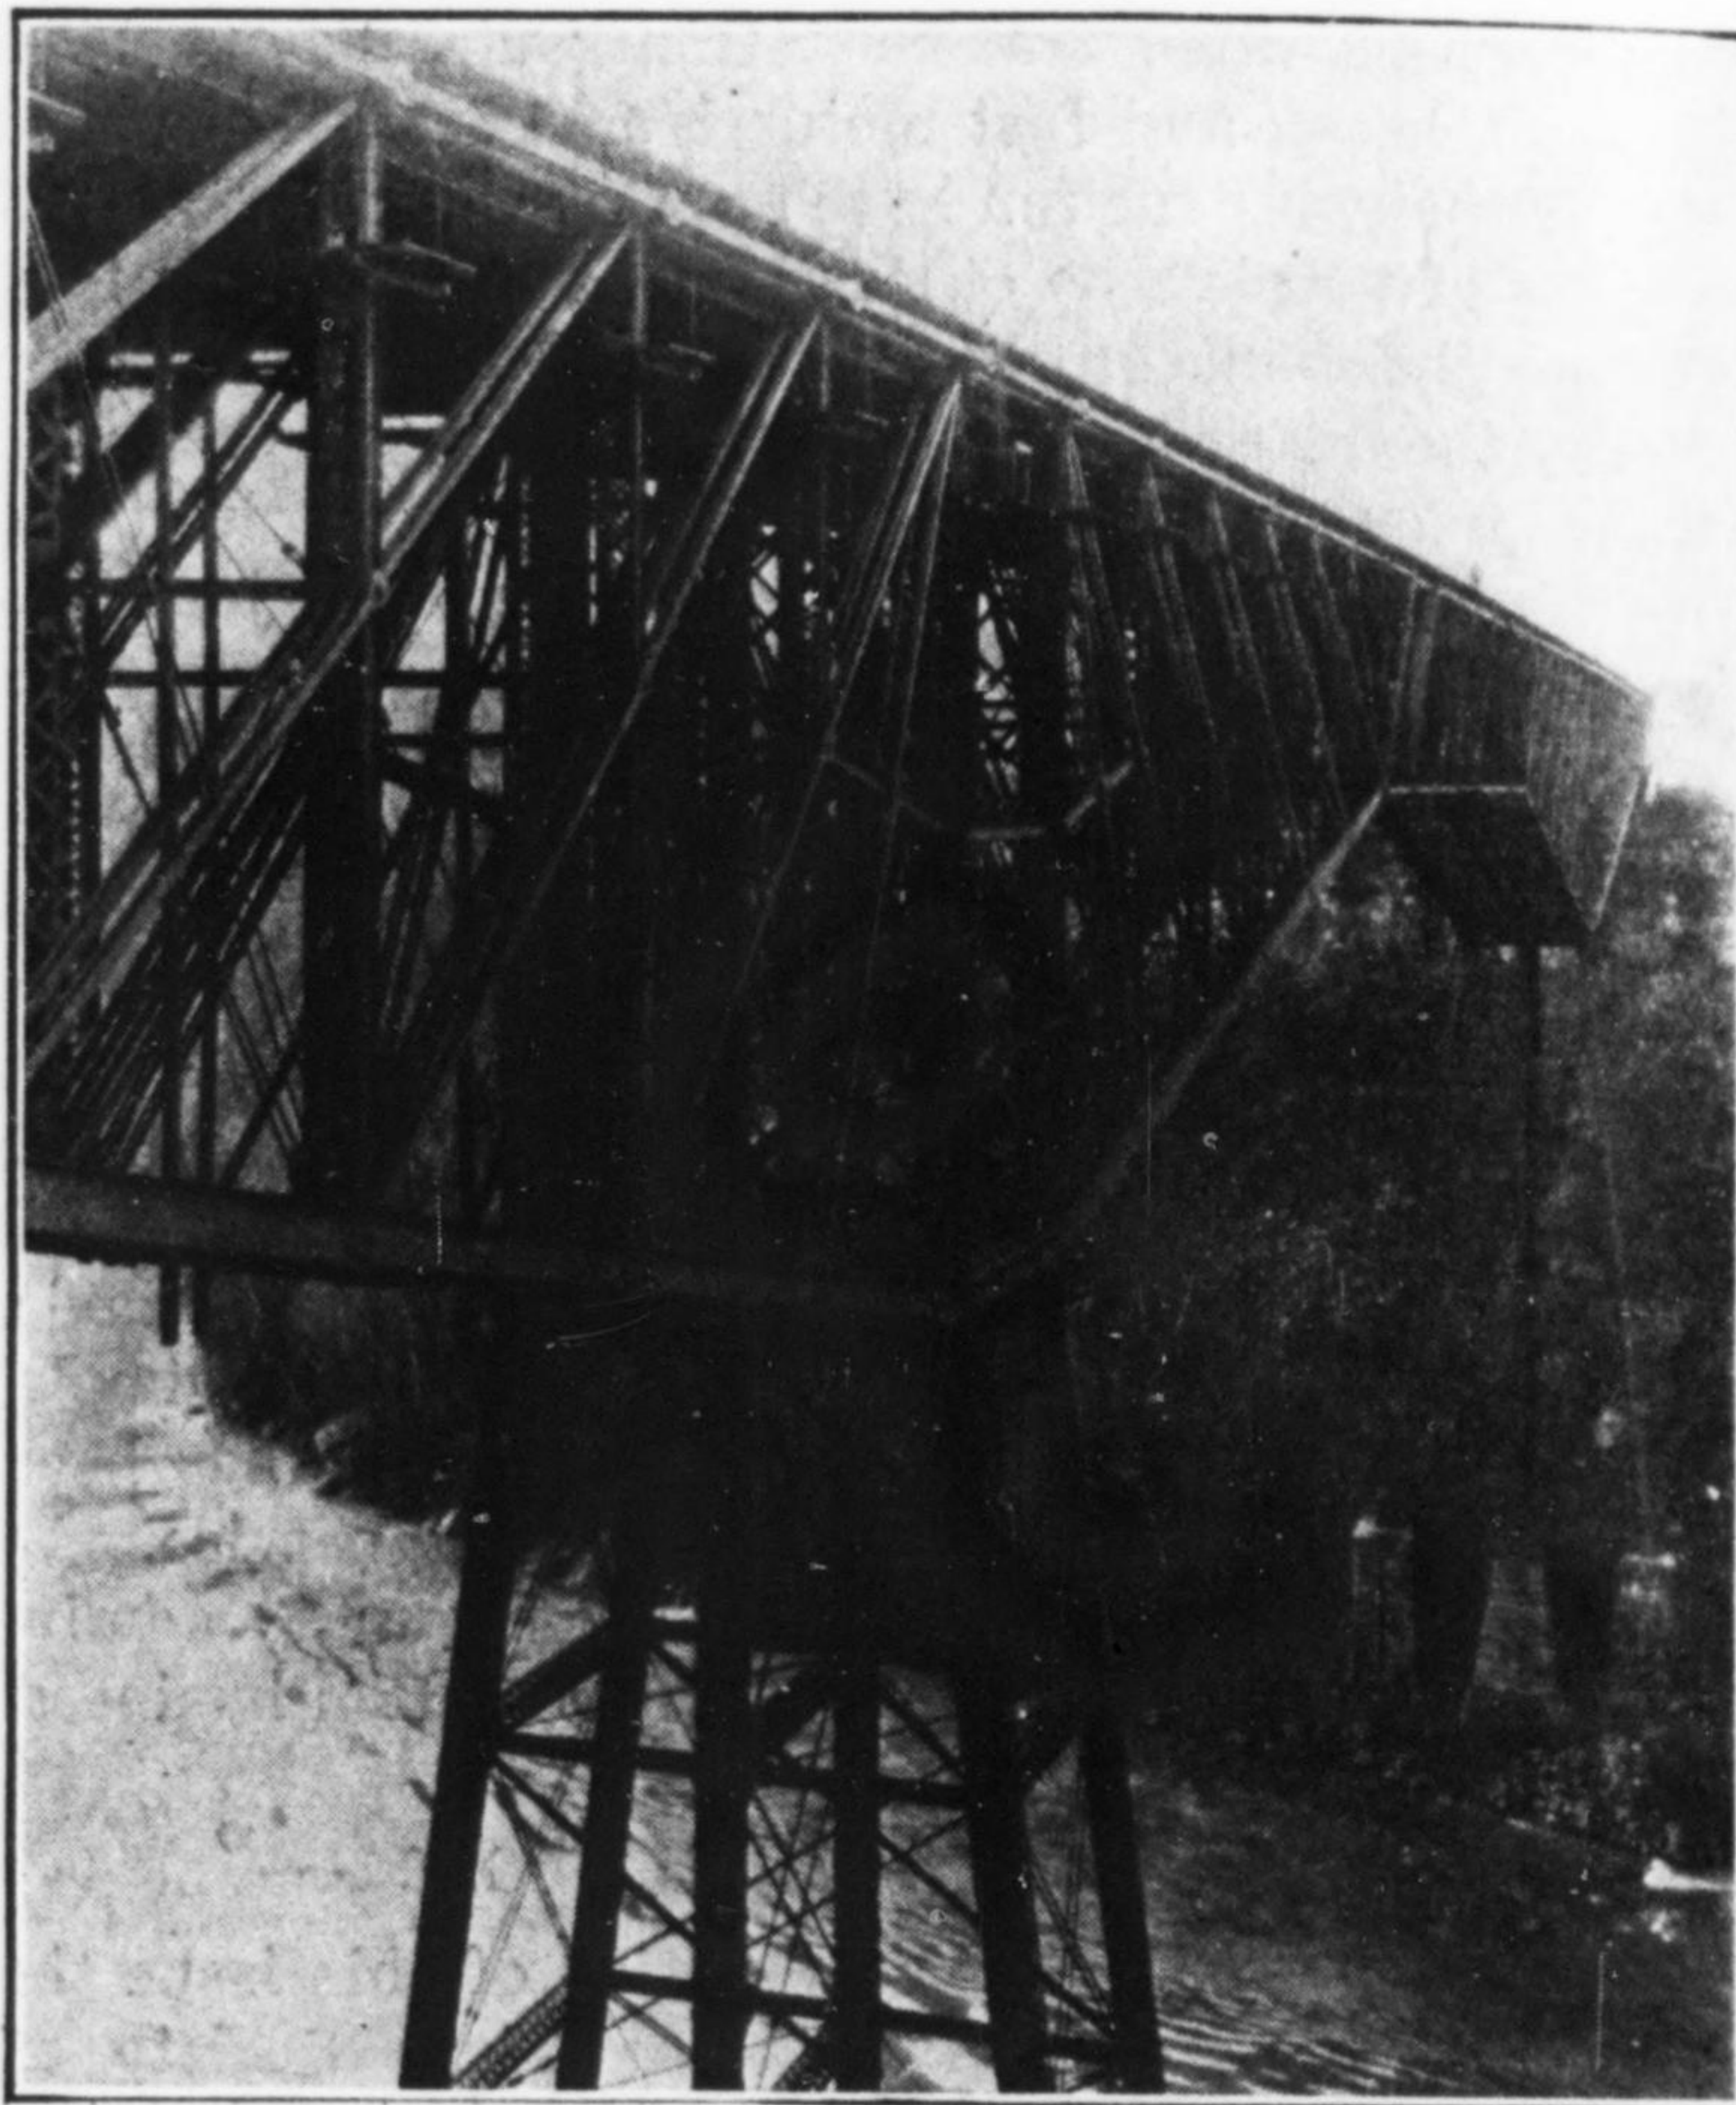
NIAGARA GORGE AT SITE OF NEW BRIDGE
